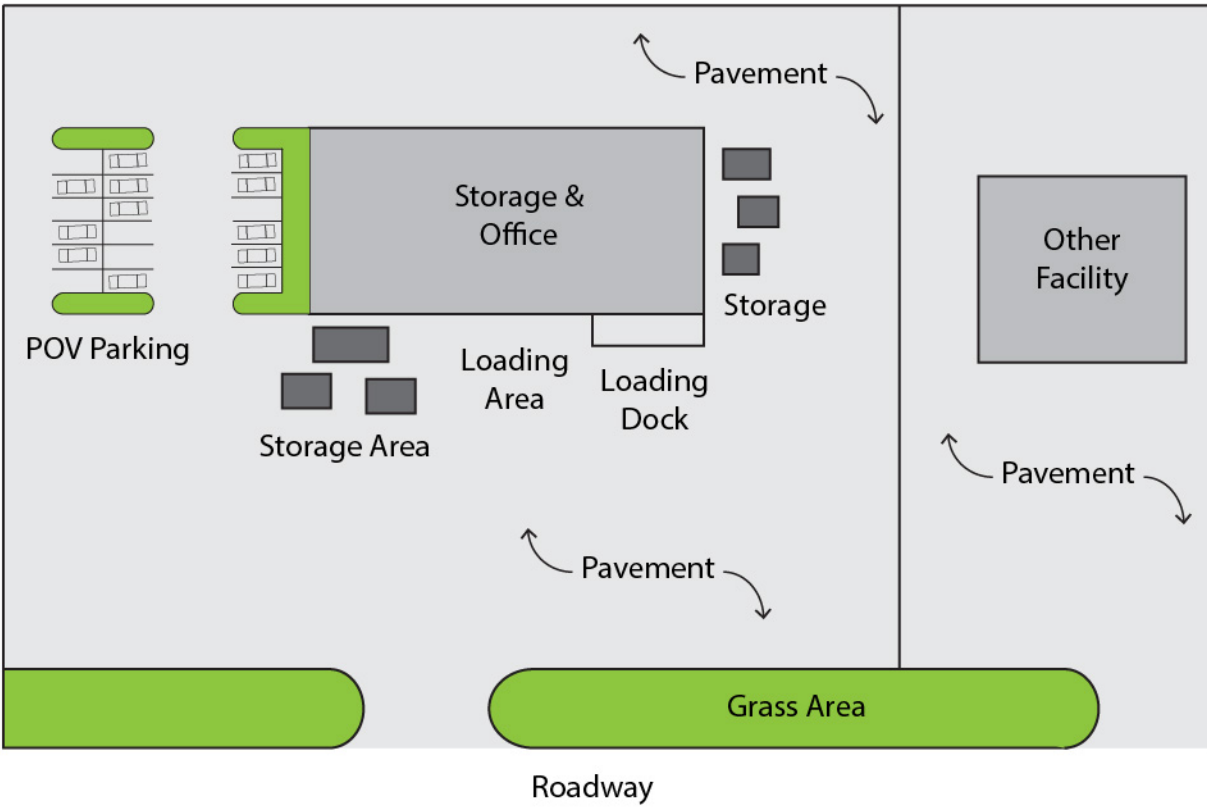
Site Plan of Metal Fabrication Shop and Area
